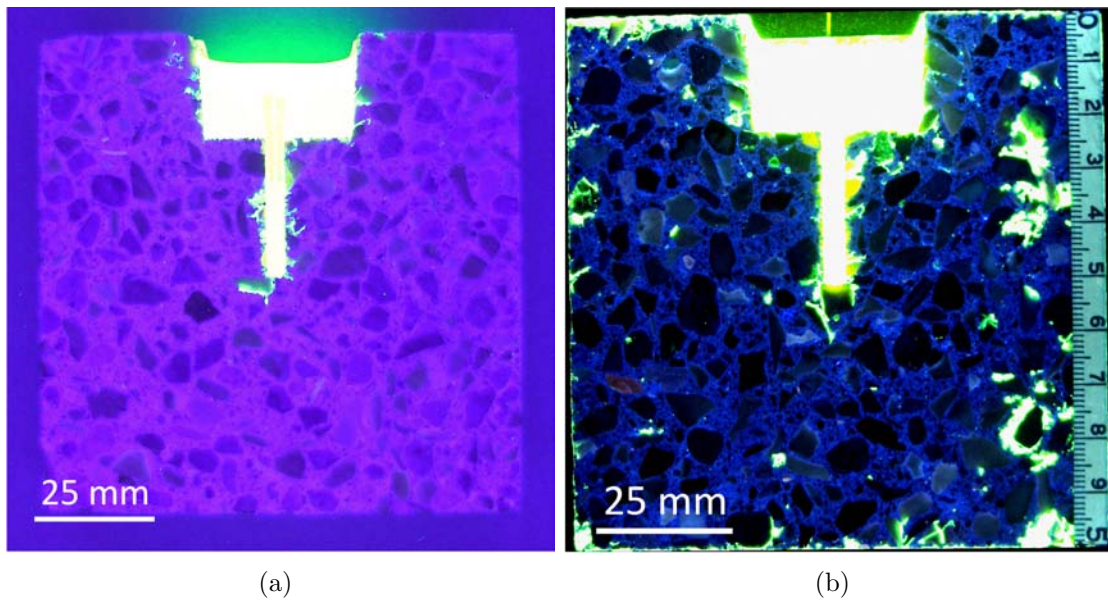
Mixture 1 - peak load specimen crack images under UV-light (a) after first impregnation and (b) a second impregnation to show isolated cracks. (Author's photos)
